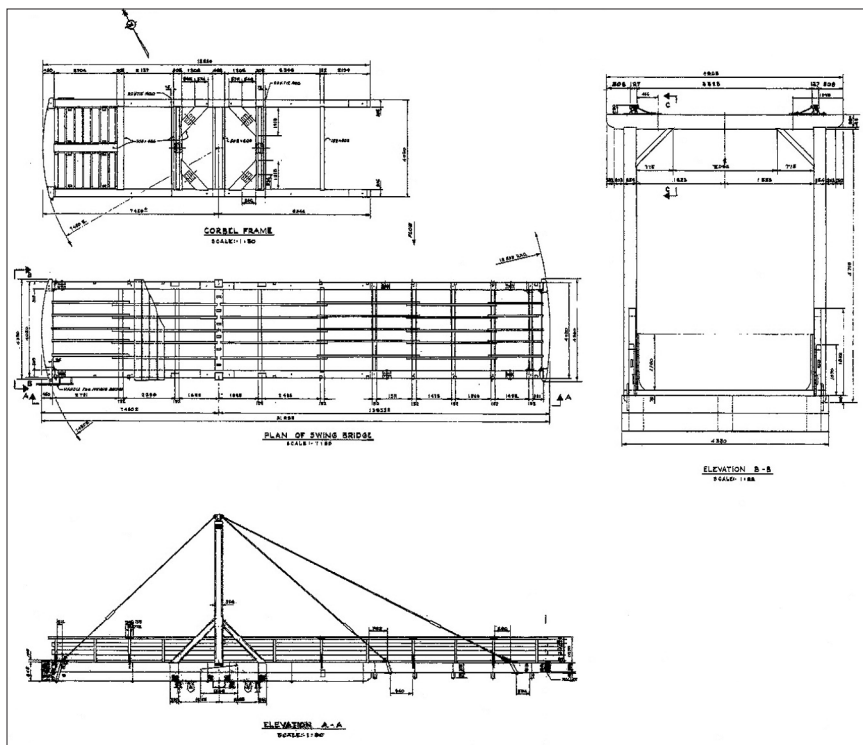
"As-found" record drawing of the extant Lower Brewer's swing bridge reconstructed in 1967 by a canal carpentry crew. (Parks Canada, "Lower Brewers, Existing Bridge." detail of Drawing 10-891, Sheet 103, January 31, 1984)
